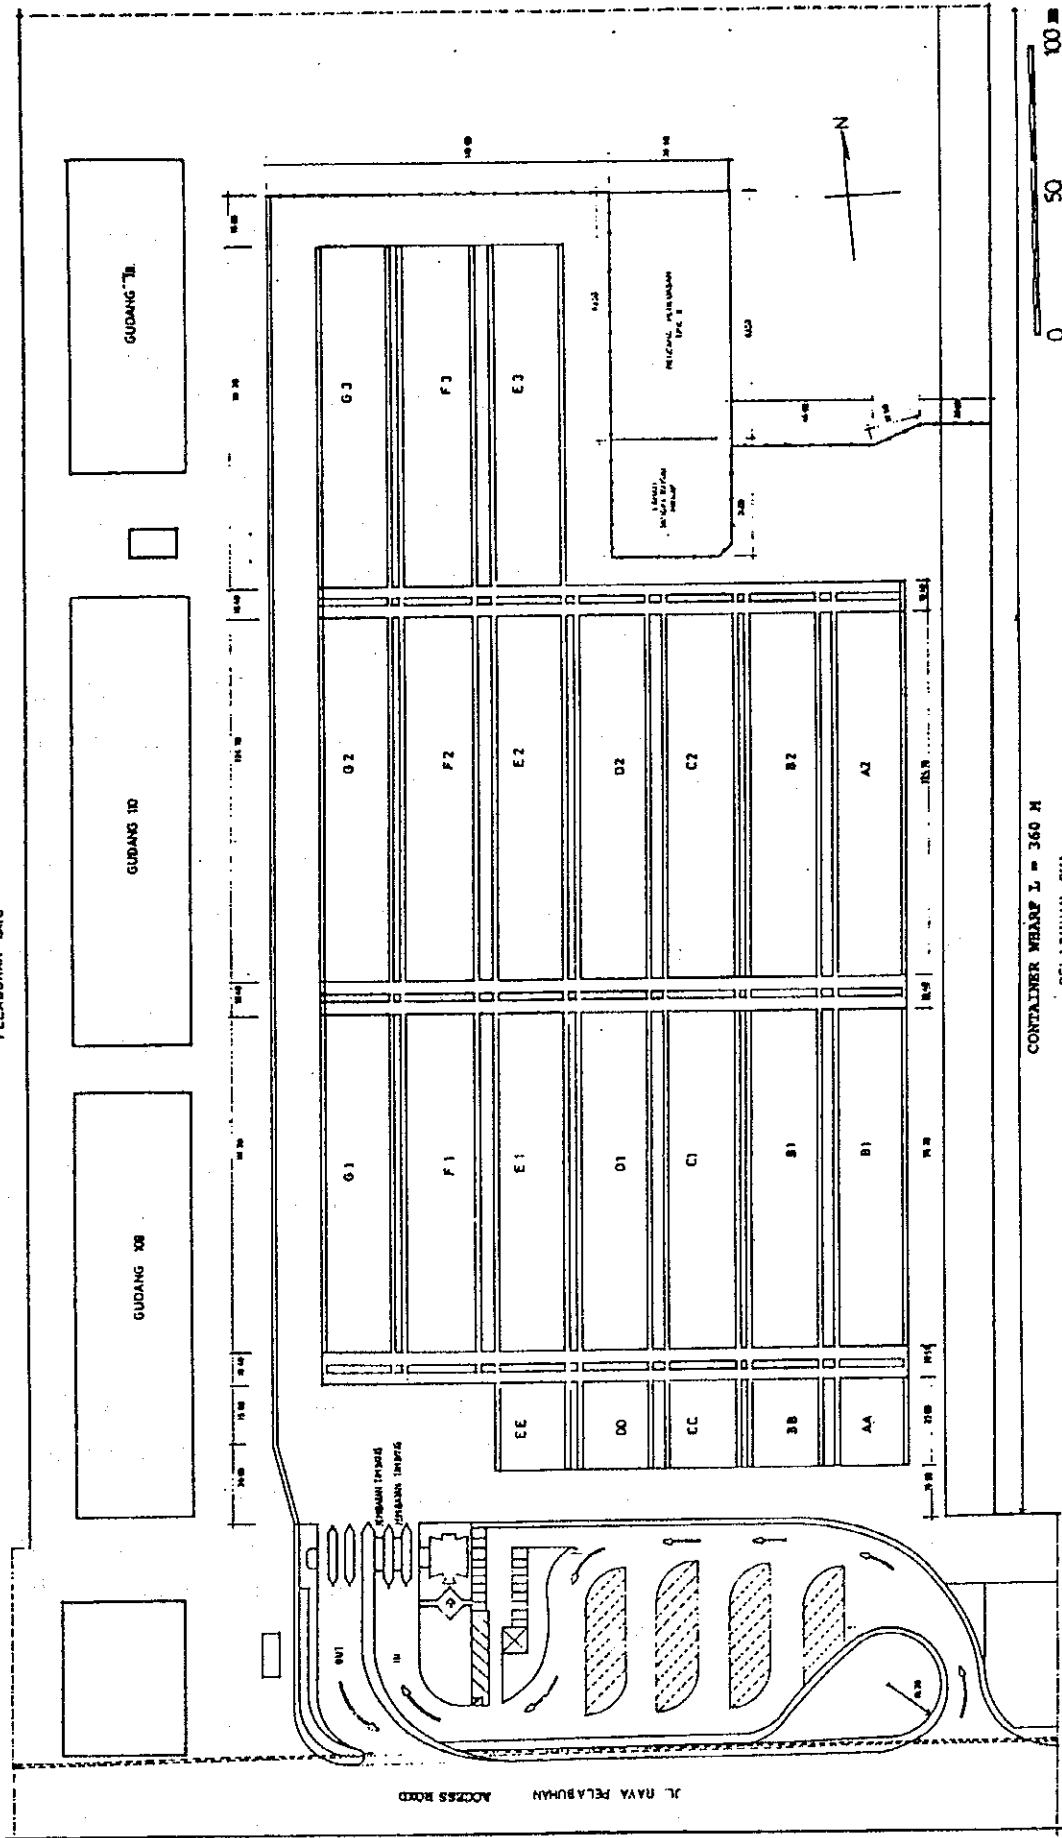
General Layout Plan of Container Terminal II port of Tanjung Priok
